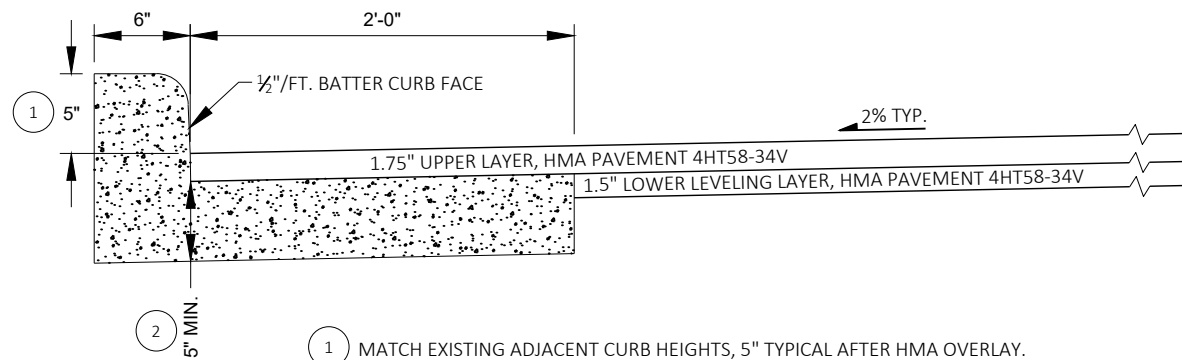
DETAIL OF PAVEMENT GRADE TRANSITION - RURAL TO URBAN
